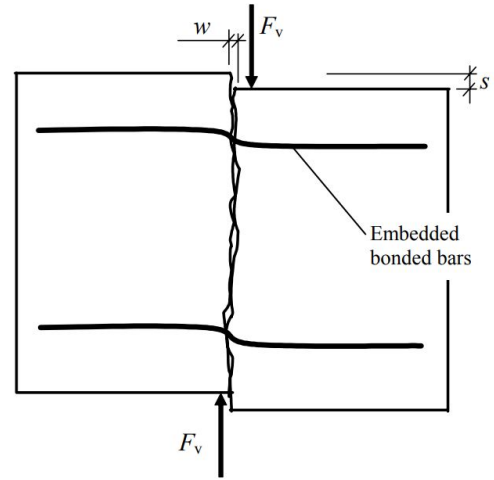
External transverse bars embedded in the concrete, anchored by bonds [15]
